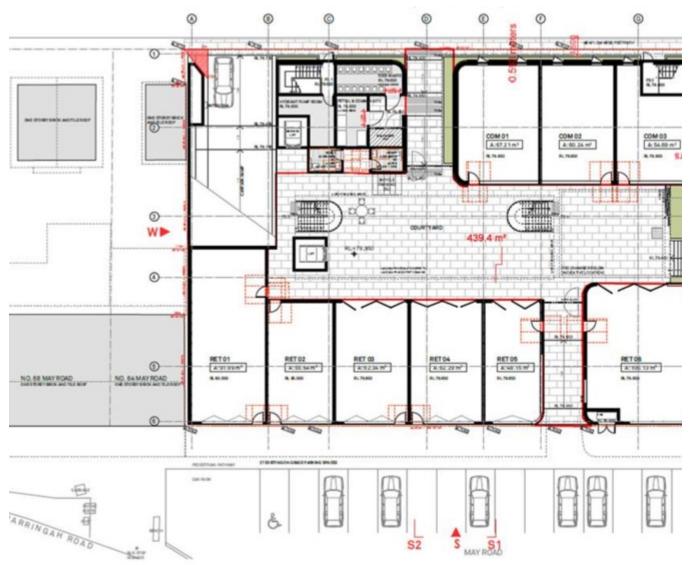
Ground Floor Plan (Source: Benson McCormack Architecture)
